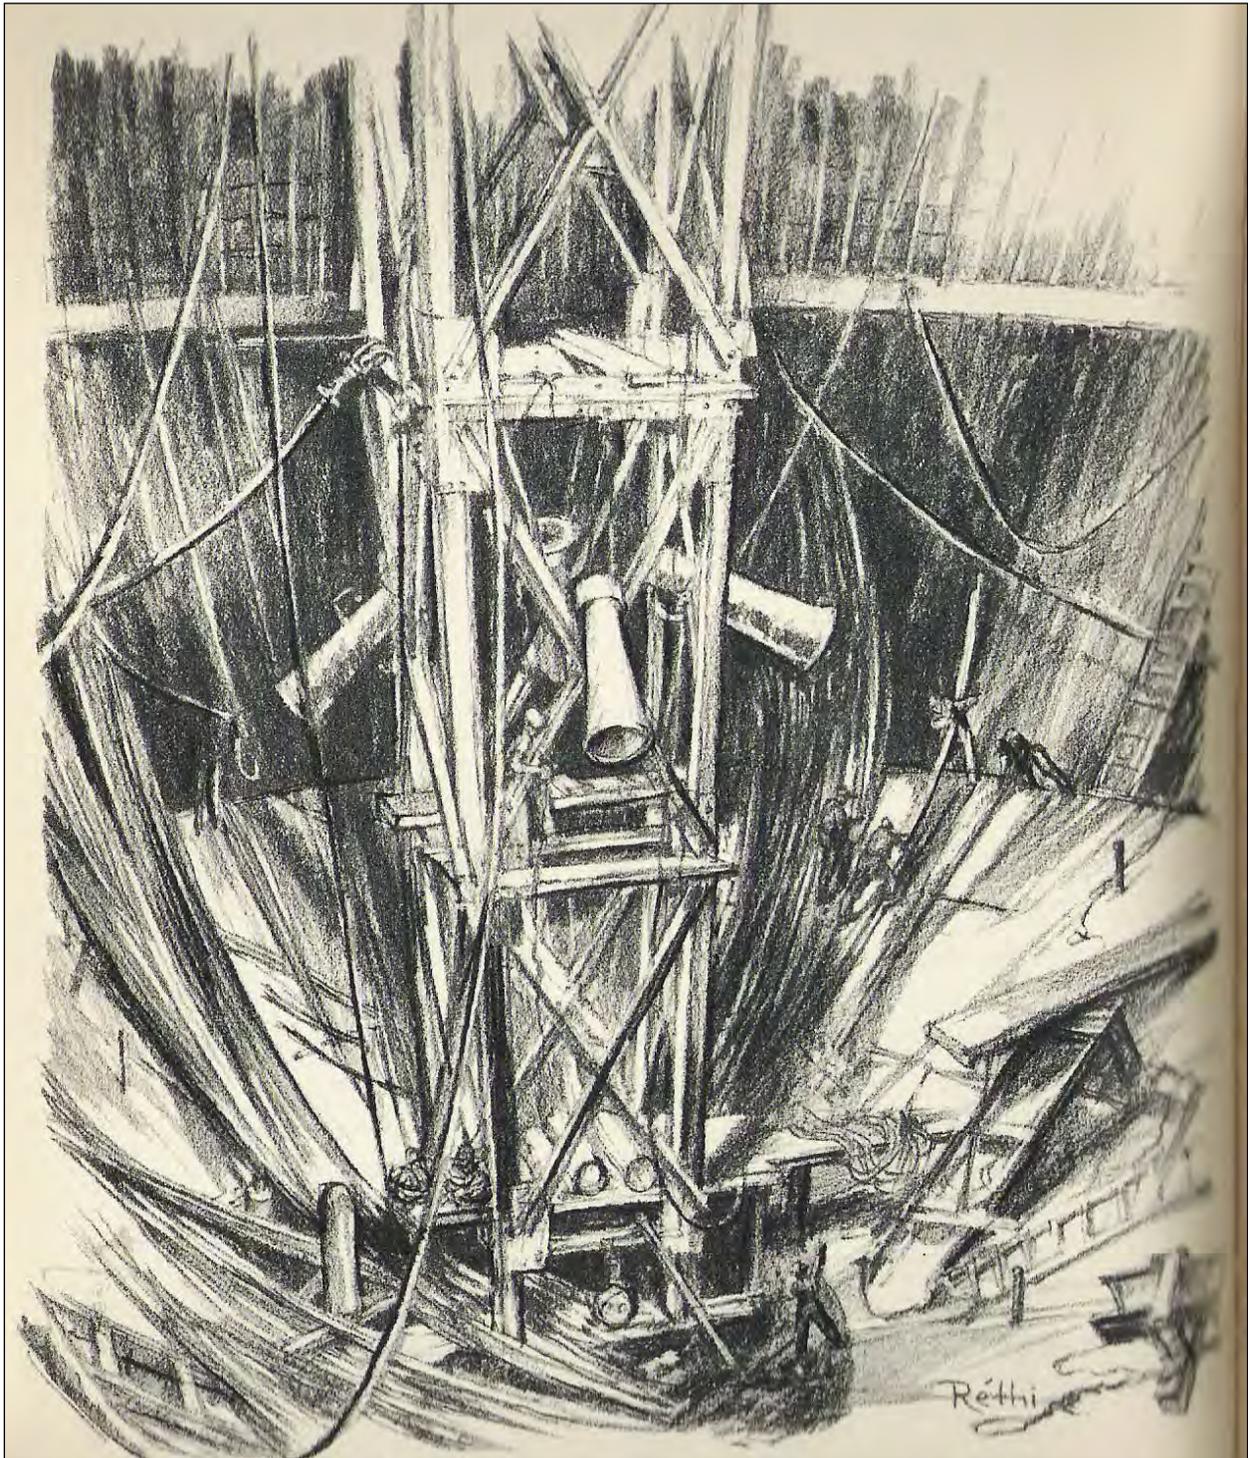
shows a sketch of a tank's lower hemisphere under construction and being lined with concrete with an inner steel lining.
